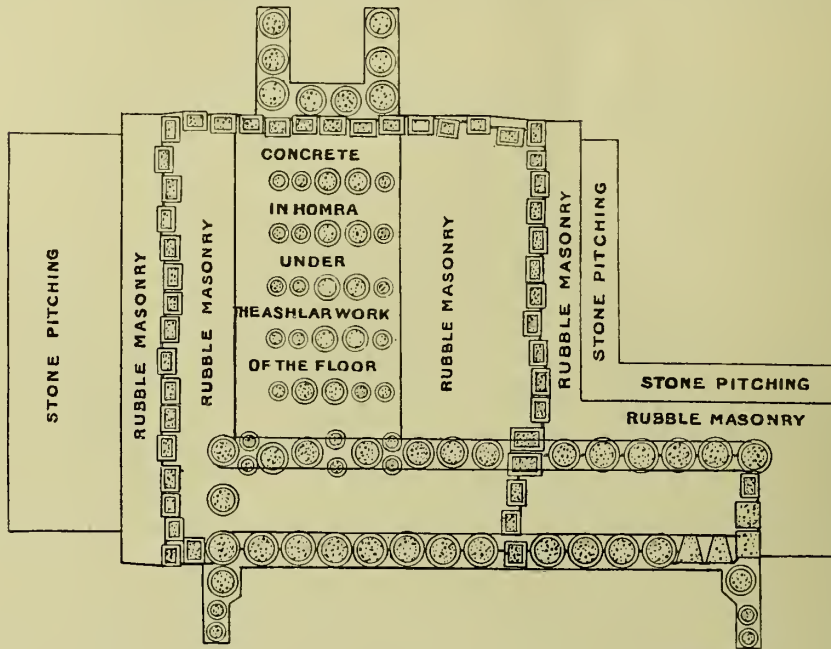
Rayah Tewfiki Head. Plan of Wells. Approx. Scale $\frac{1}{8}$ inch = 1 foot.
